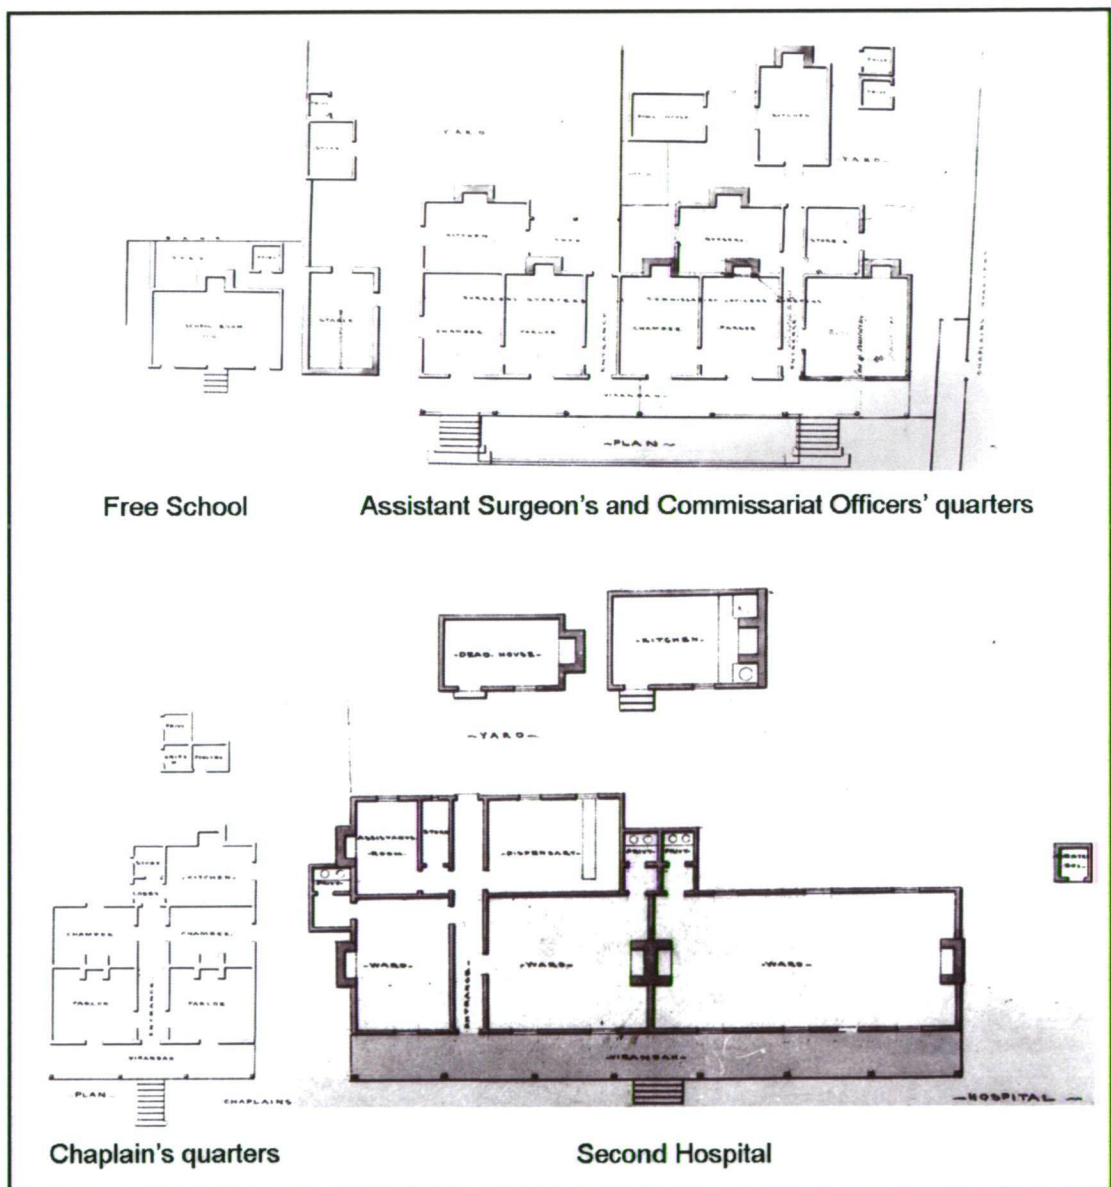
A montage of Laing plans c1836, depicting the internal configuration of rooms in the four primary buildings erected on the main terrace (courtesy of PAHSMA, AOT ref CON 87/#15, #18, #21, #26). Not to scale.
